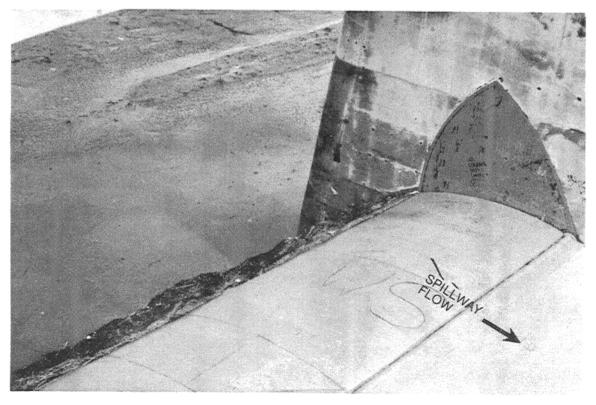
Spillway Gate in Lowered Position (view from spillway bridge, with reservoir to left).
